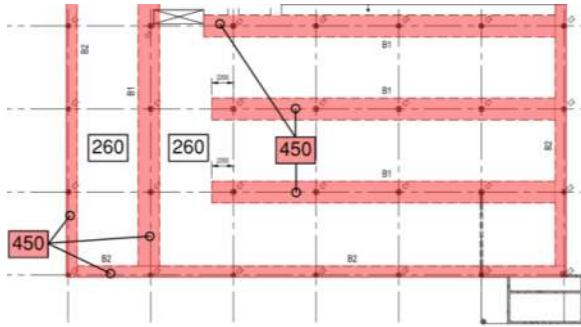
Model 1 slab and beam thicknesses south of the lift core.
